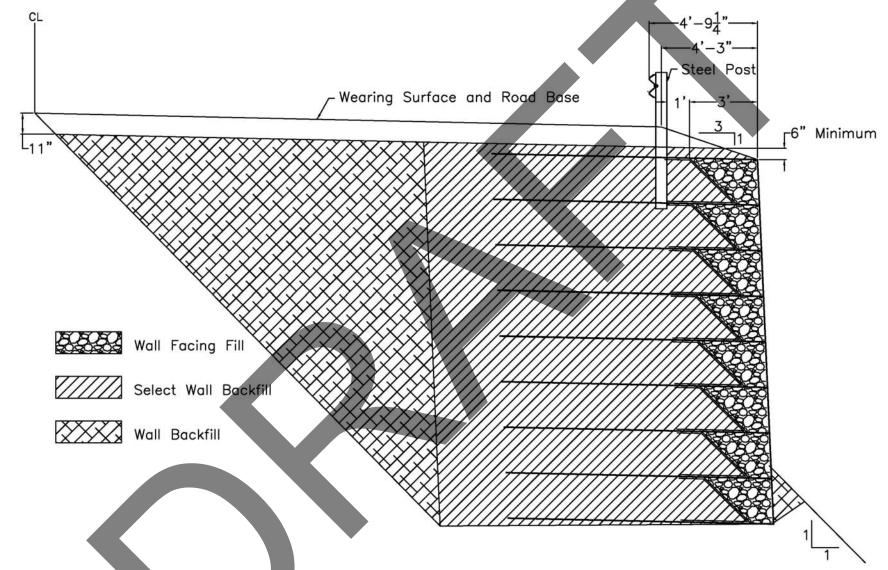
Schematic. Non-Blocked, Steel-Post MGS Centered at Slope Break Point with Minimum Lateral Offset.
